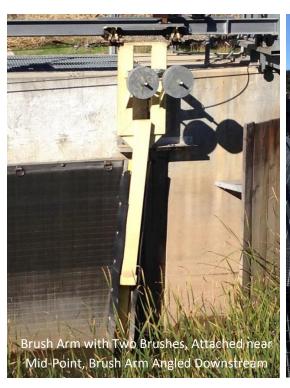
Site Visit Photo Summary, Sheet 2 of 2
